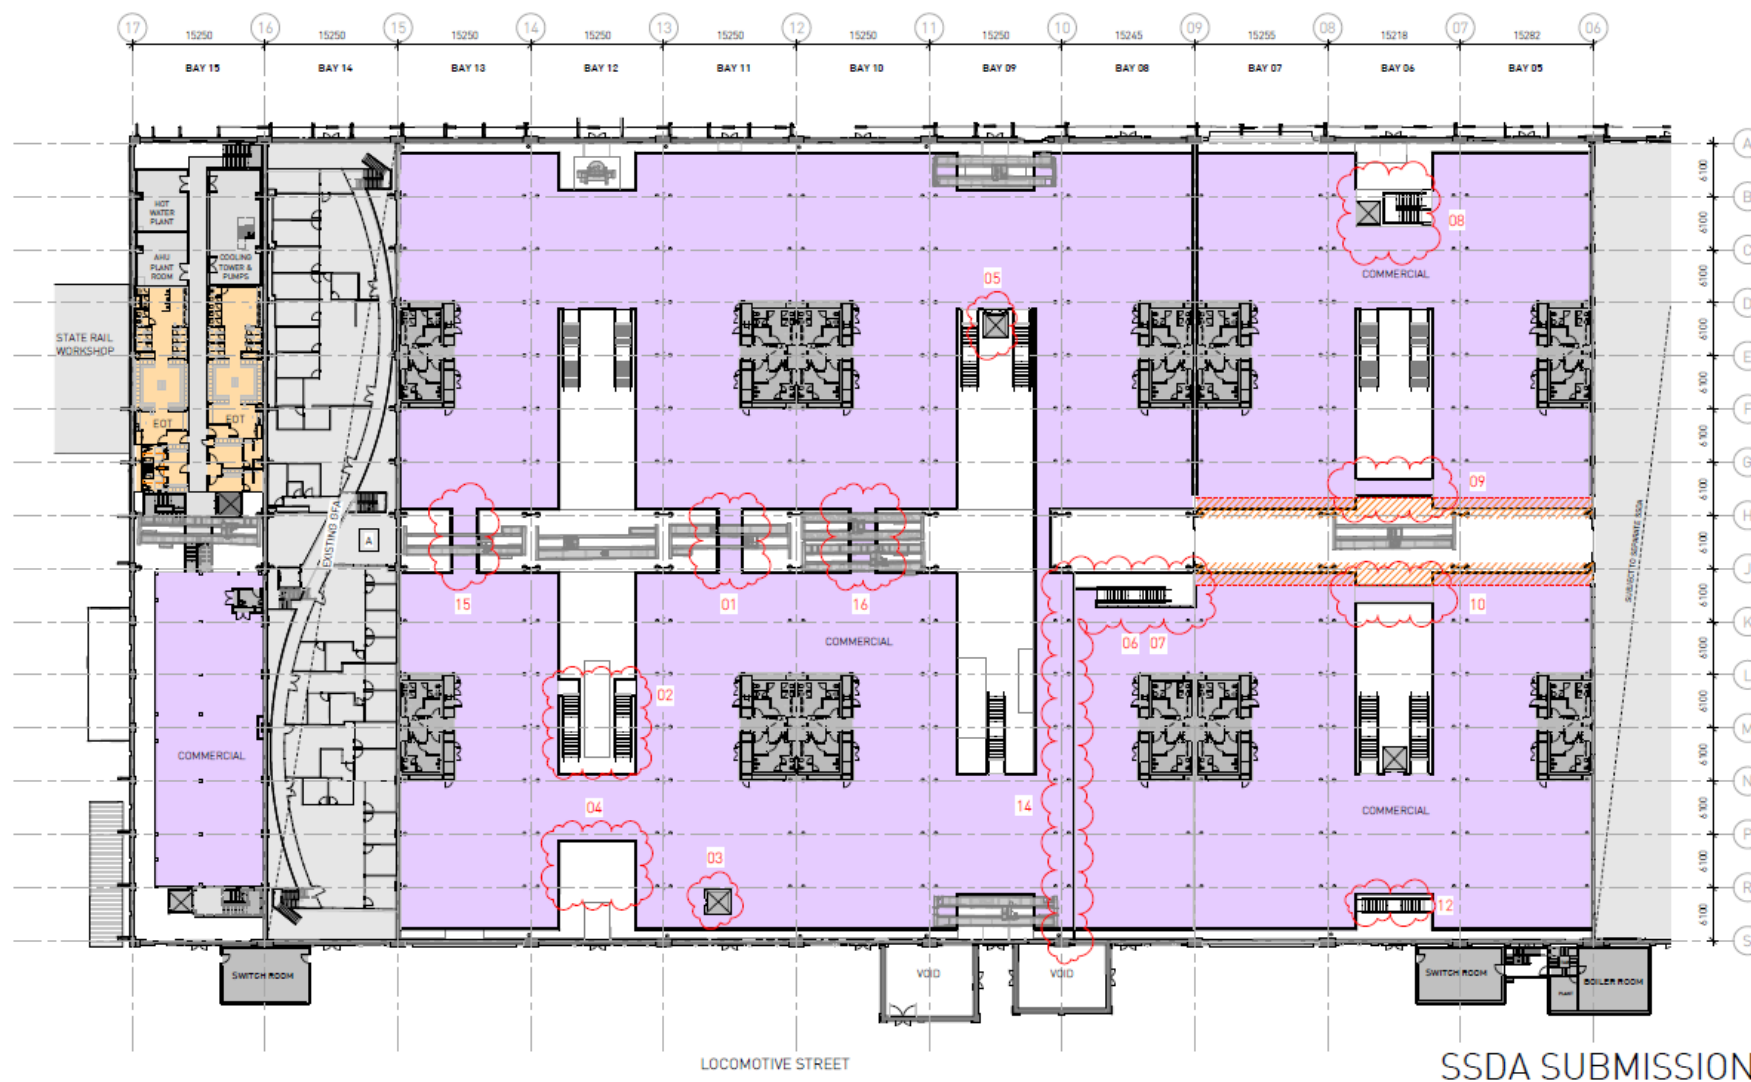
Bays 5-15 First Floor Proposed Layout. Modifications in red. (Source: Sissons 2019)
